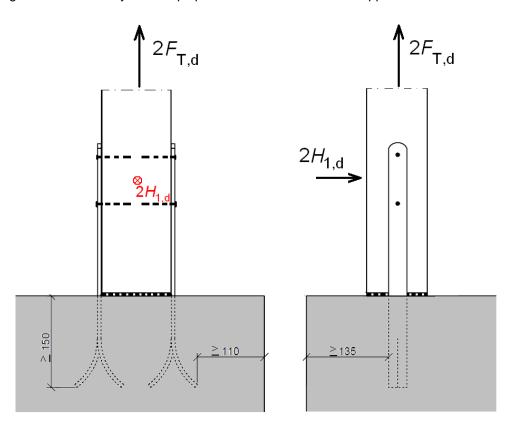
Use of Column Anchor Straps and the definition of forces.
